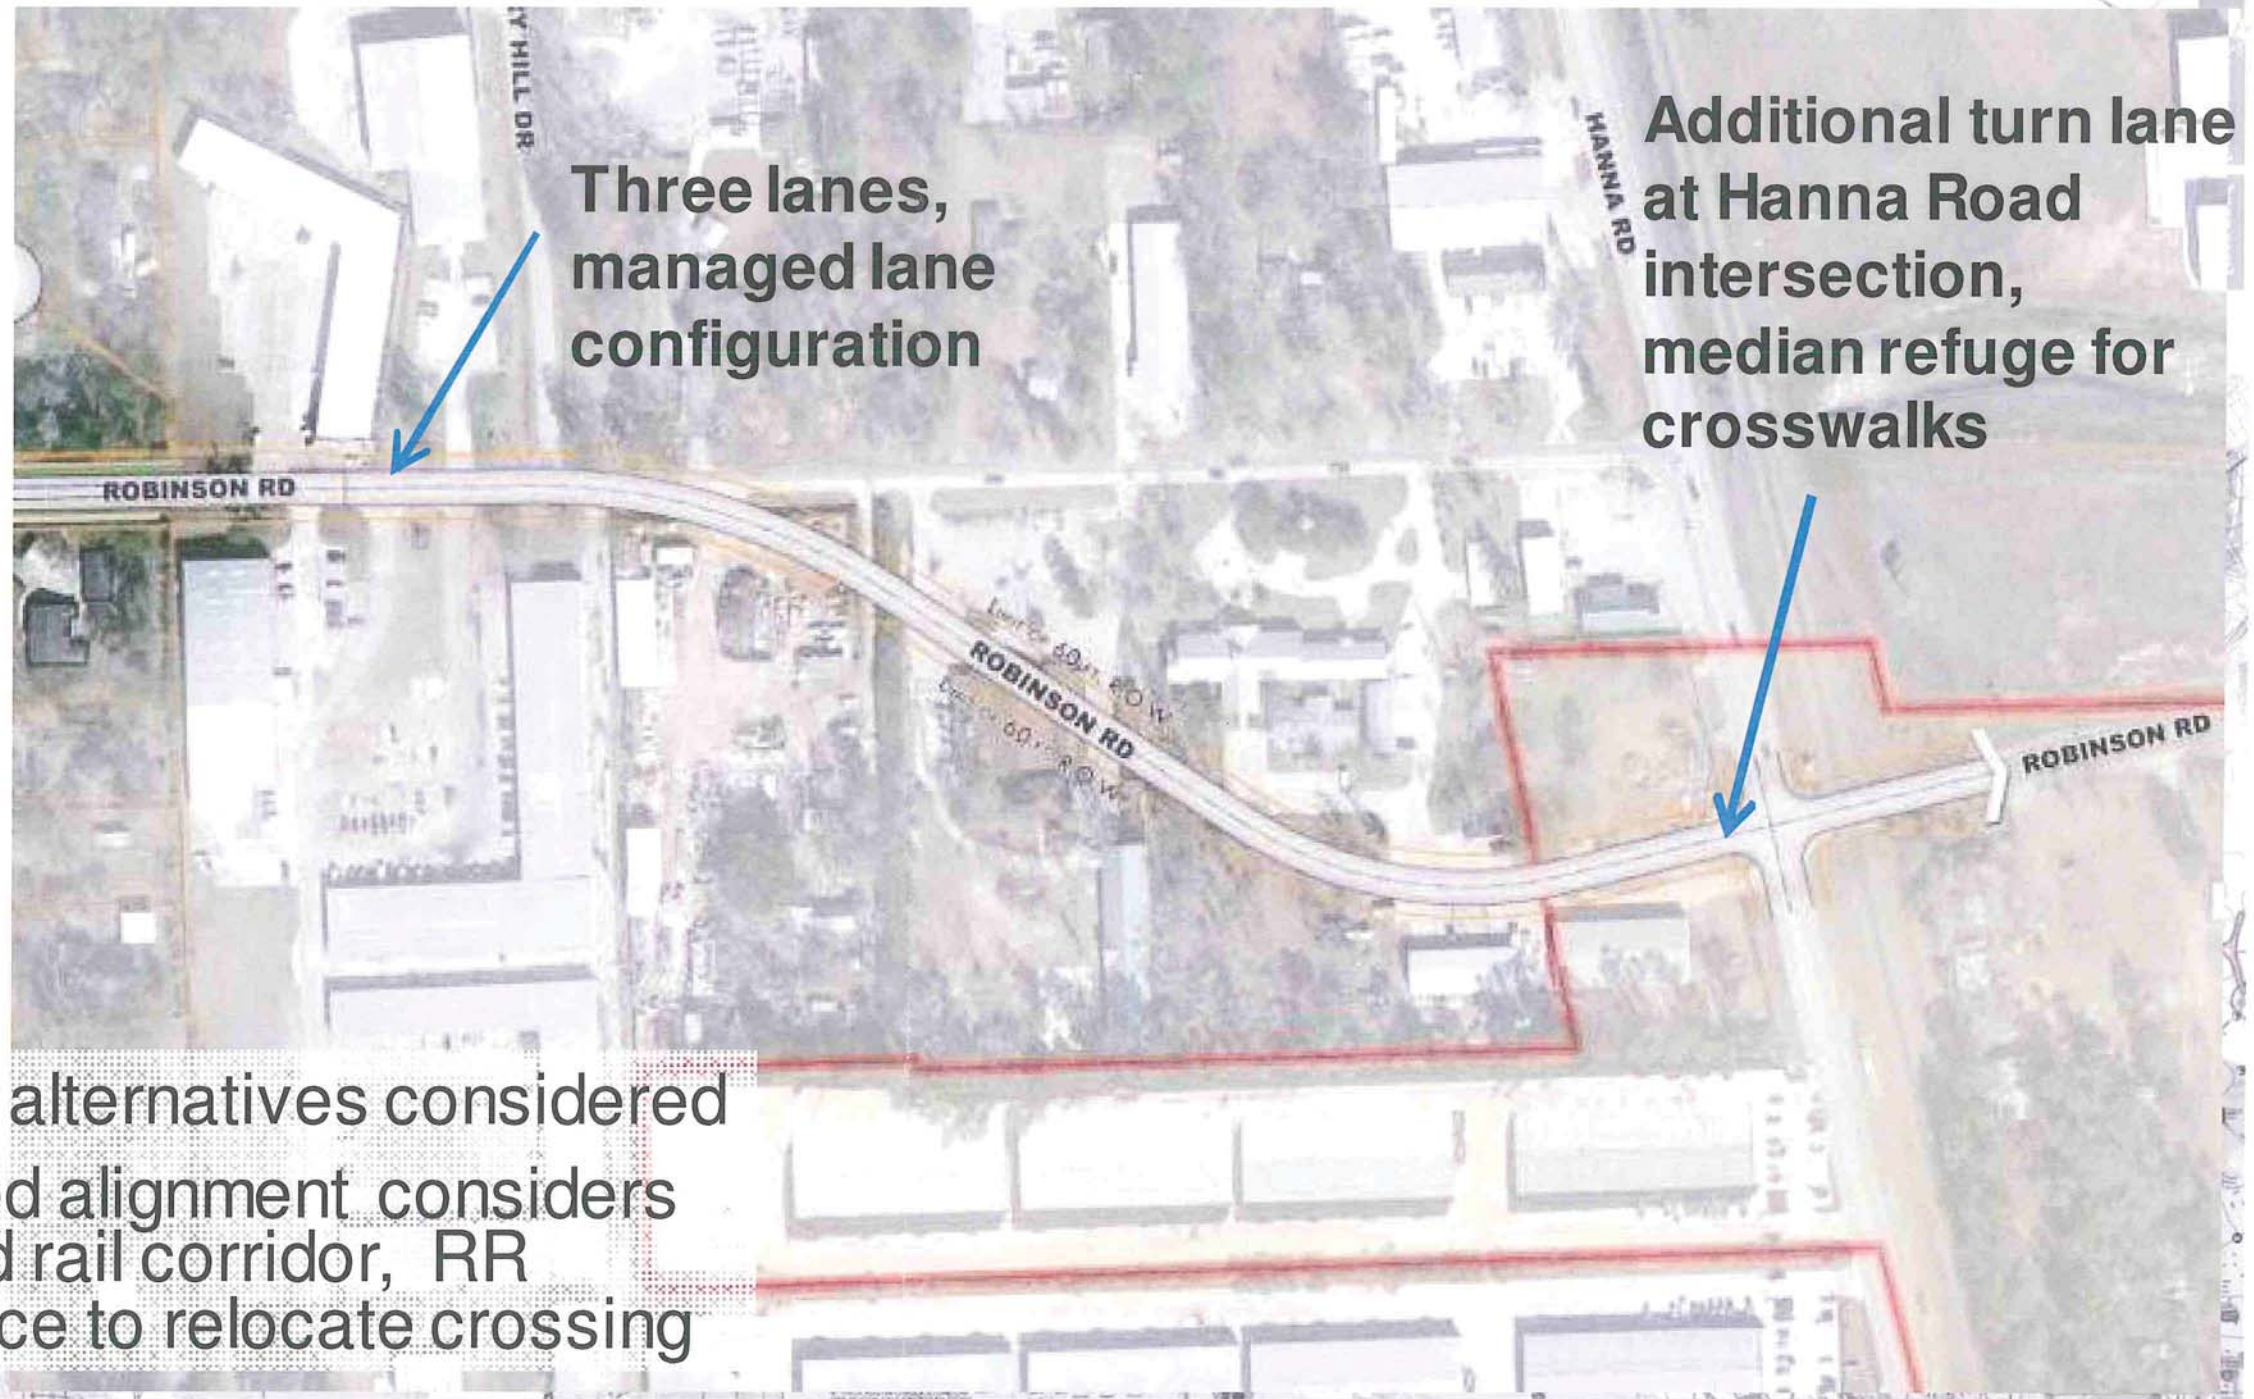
Proposed re-configuration of Robinson Road and Woodlands Parkway (image source: Jones and Carter Inc.)
